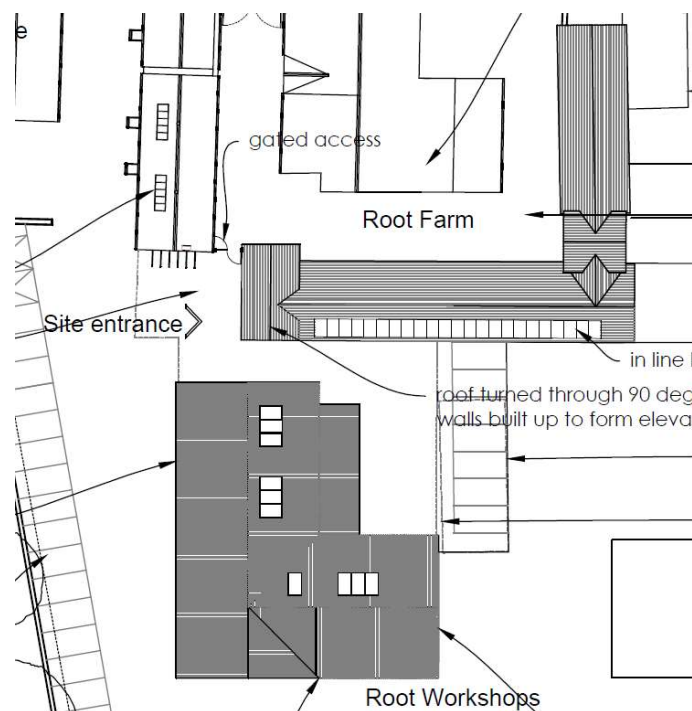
Site Plan extract showing workshop buildings to the south and studios to the north.
